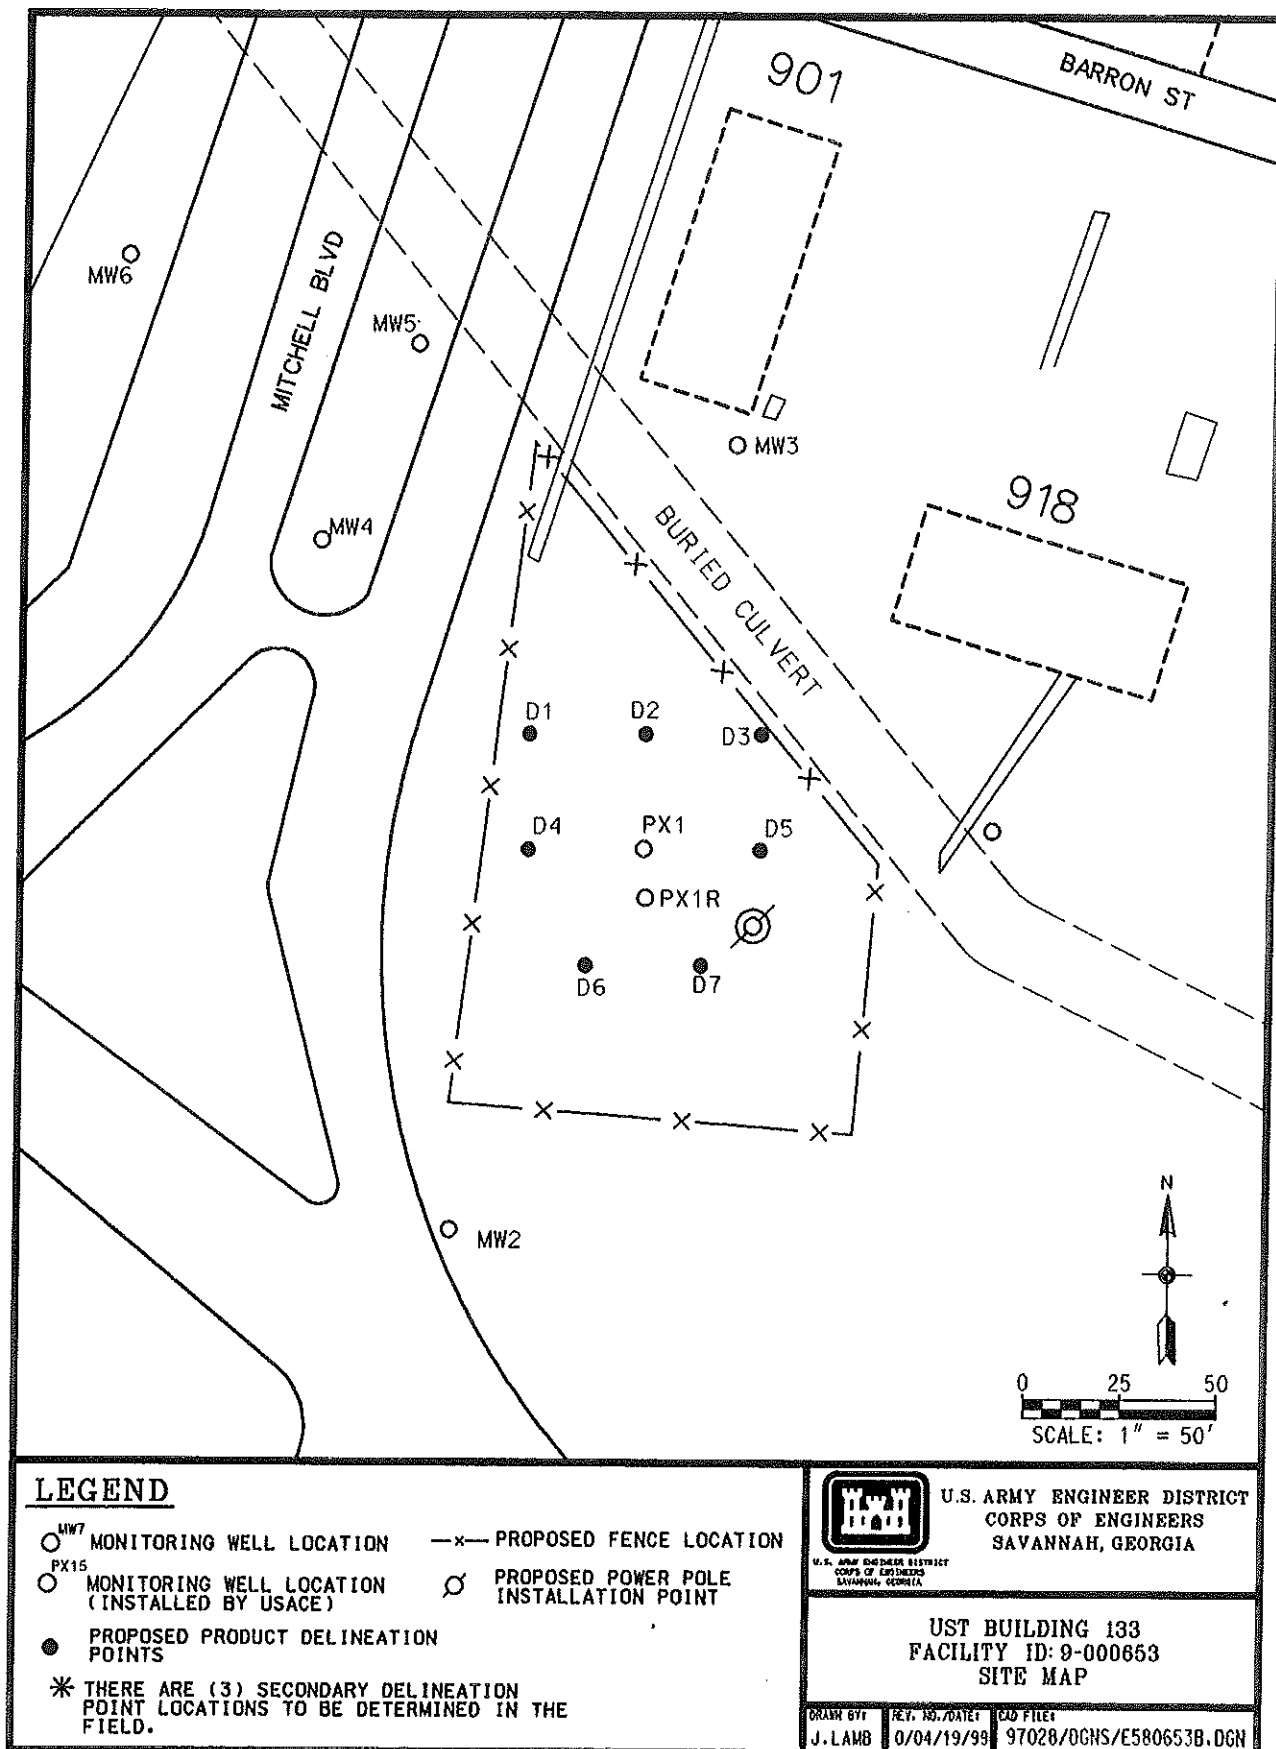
Locations of Product Delineation Points for Former Building 133 Site
